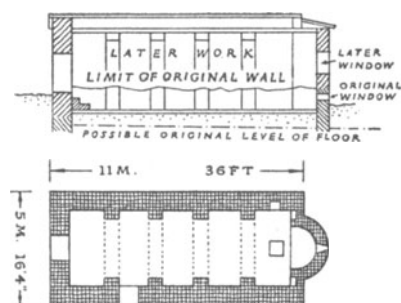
CHURCH AT SVETI ILIJA. Plan and section
